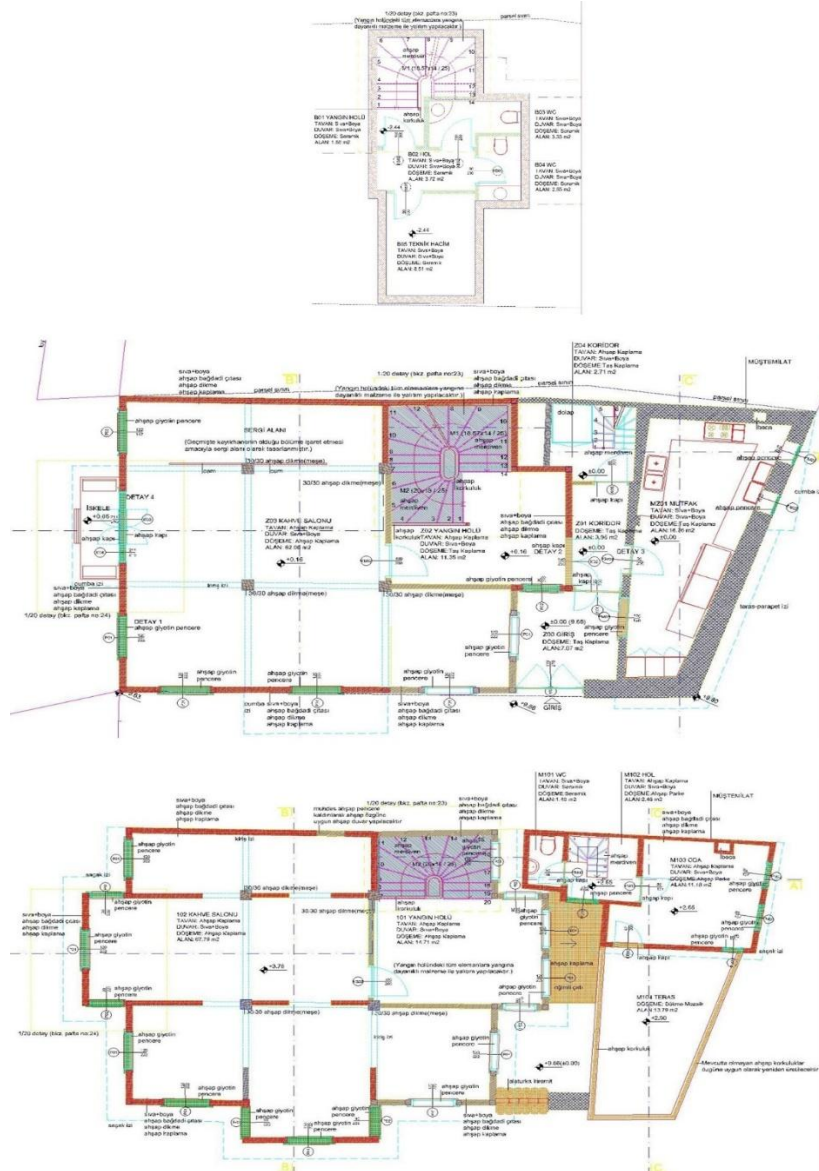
Basement Floor Plan, Ground Floor Plan, 1. Floor Plan (Author, 2017).
